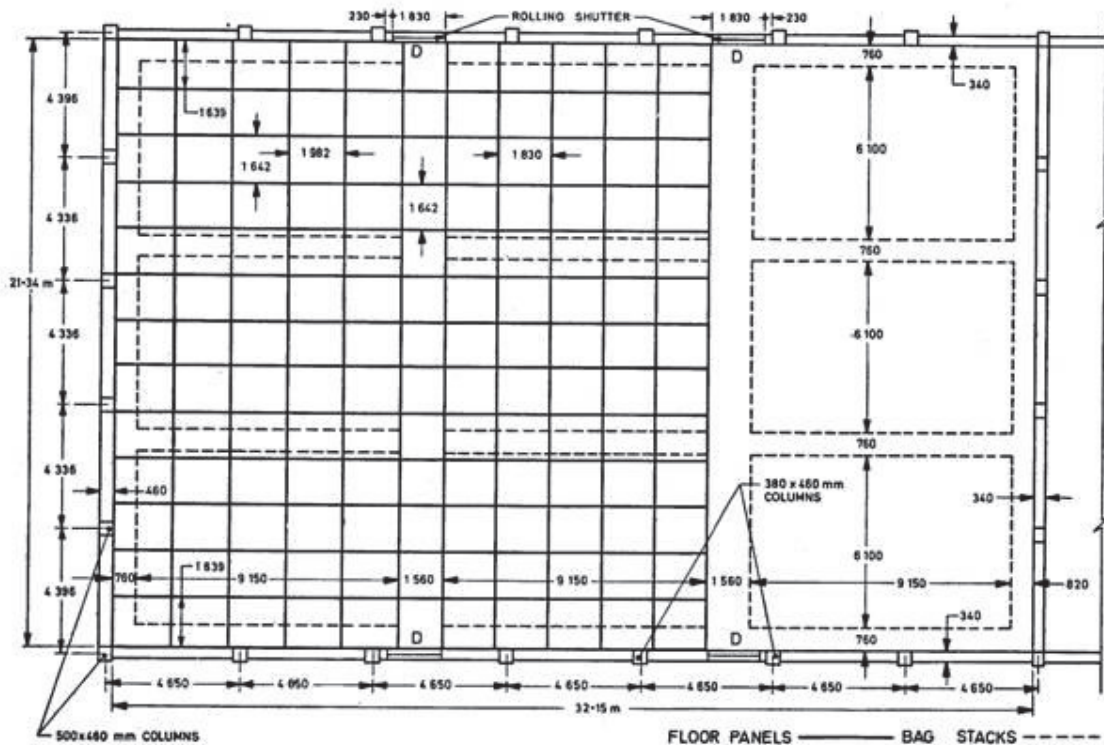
DETAILS OF FLOORING (MAIN GODOWN)
